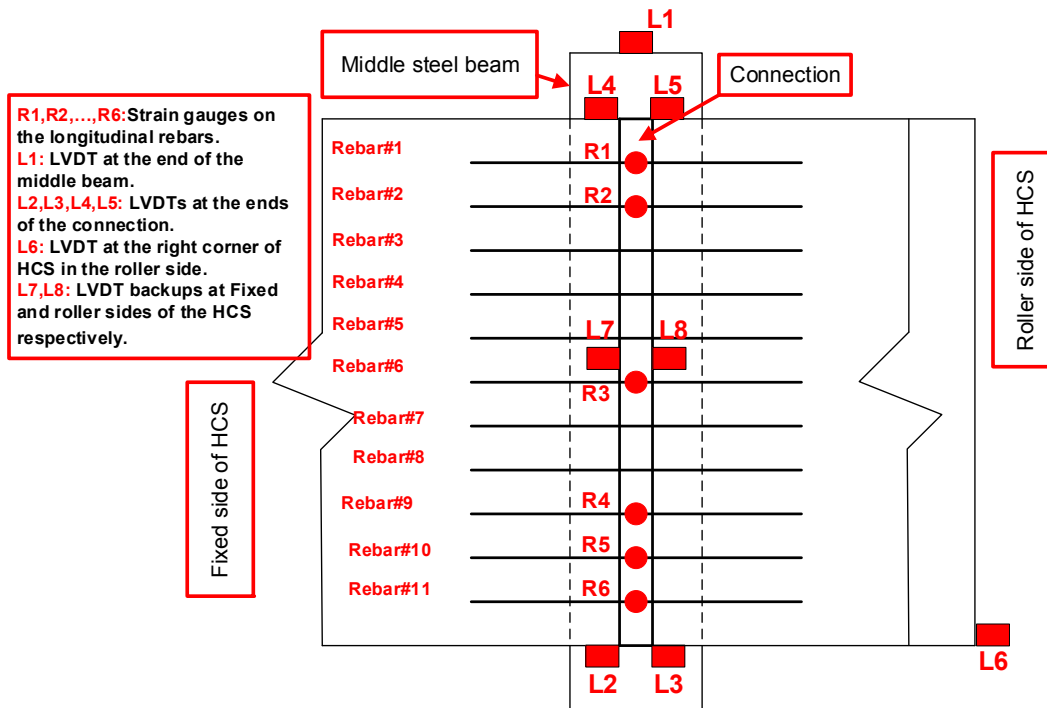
Layout locations of the rebars' strain gauges and LVDTs.
